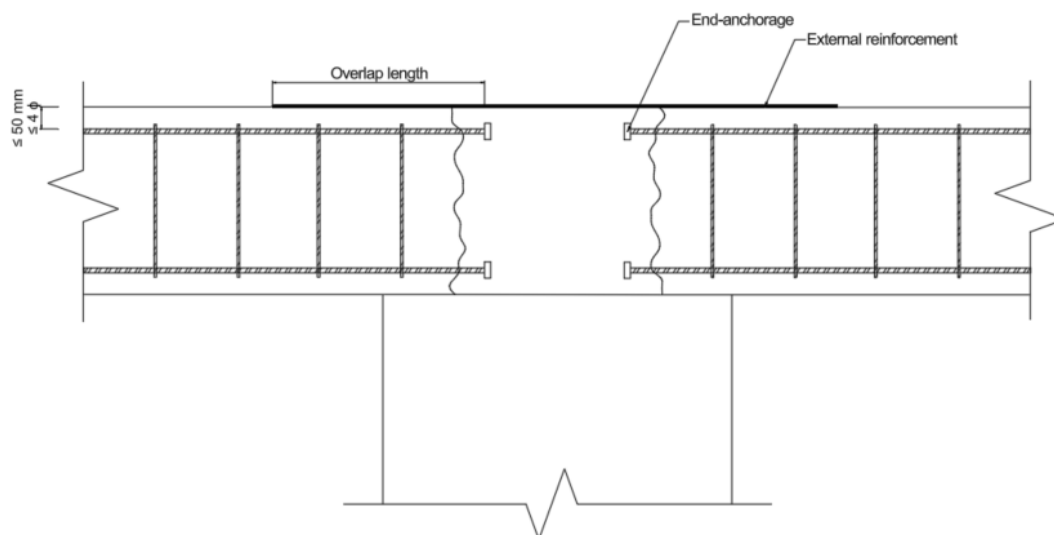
Reinforcement reconnecting proposal with external strengthening
